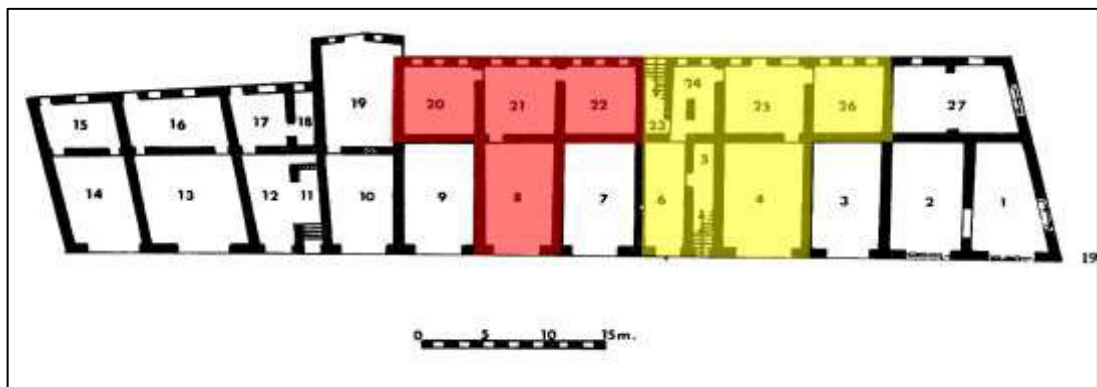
Plan of the Caseggiato delle Trifore, ground floor, Housing Unit 1-2 (modified from Packer 1971: plan 19).
